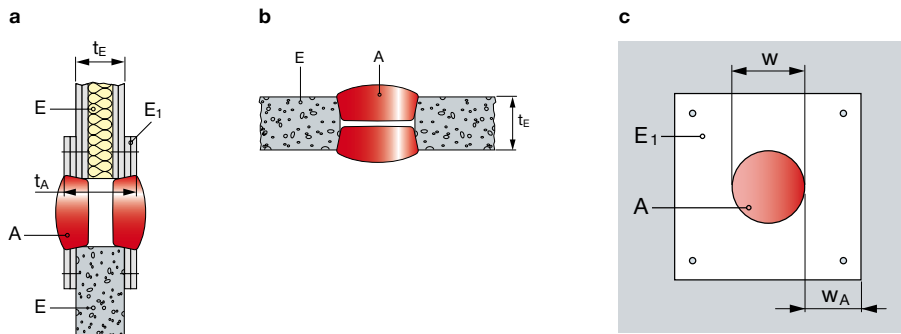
Aperture framing / beading and position of the seal in walls / floors
